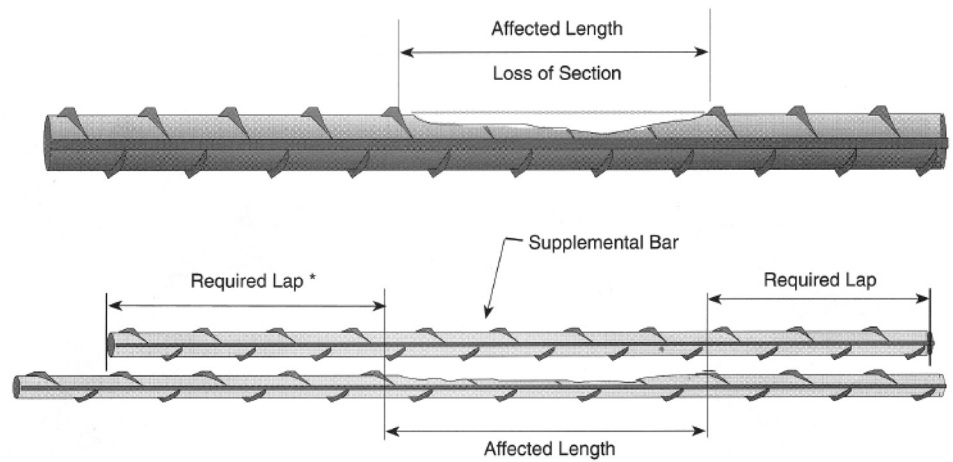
Repair of reinforcing steel due to loss of section where the loss of section is greater than 10 percent (ICRI No. 310.1R).
